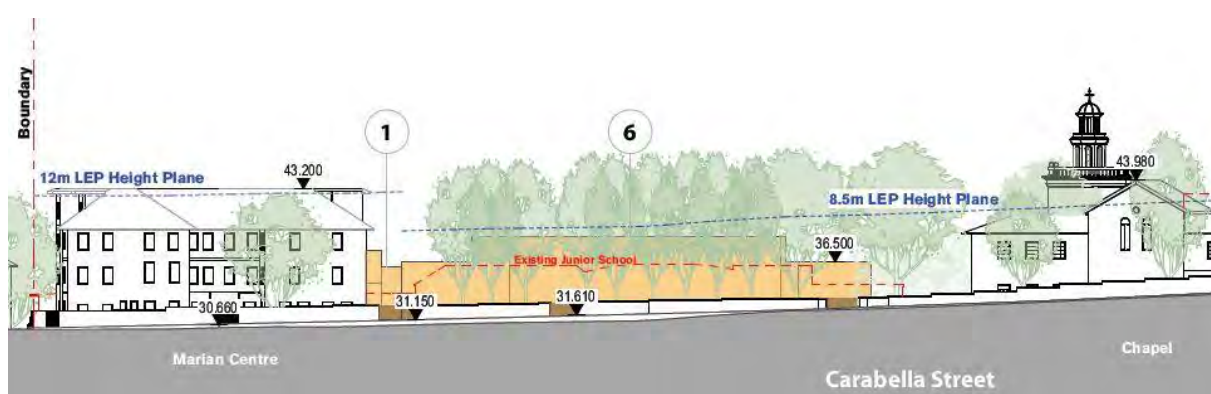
Proposed Carabella Street elevation, showing the scale of the proposed new building, which is low in height compared to the neighbouring Marian Centre and chapel building. The outline of the existing Junior School is shown with a red dotted line. (Source: fjmt, 'Final Stage Envelope elevation', excerpt from MP-3002)
